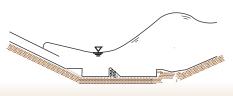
C7: Downstream Elevation View of the Tidal Gates
